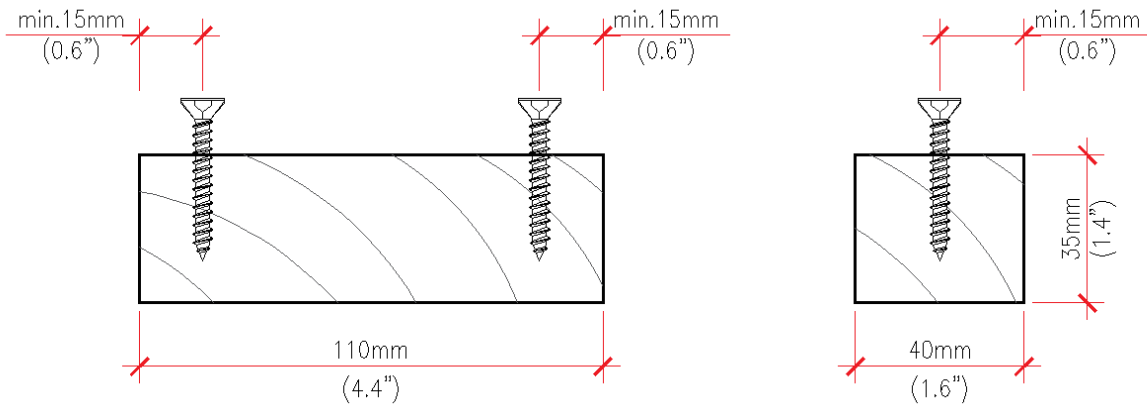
Wooden section, minimum strength of class C18 (EN338)
